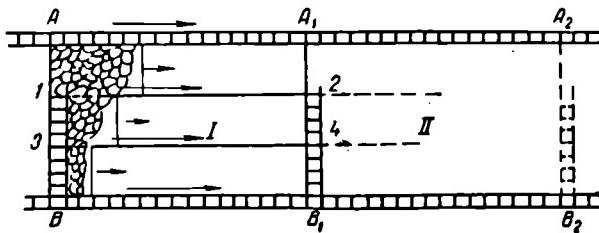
Long pillar mining on strike with coal hauled to the front mine slope
